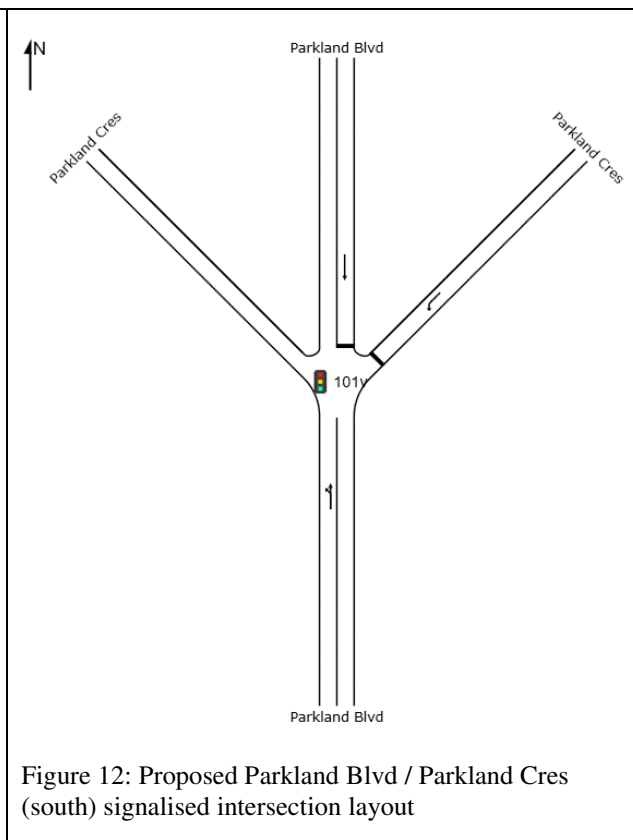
Proposed Parkland Blvd / Parkland Cres (south) signalised intersection layout
